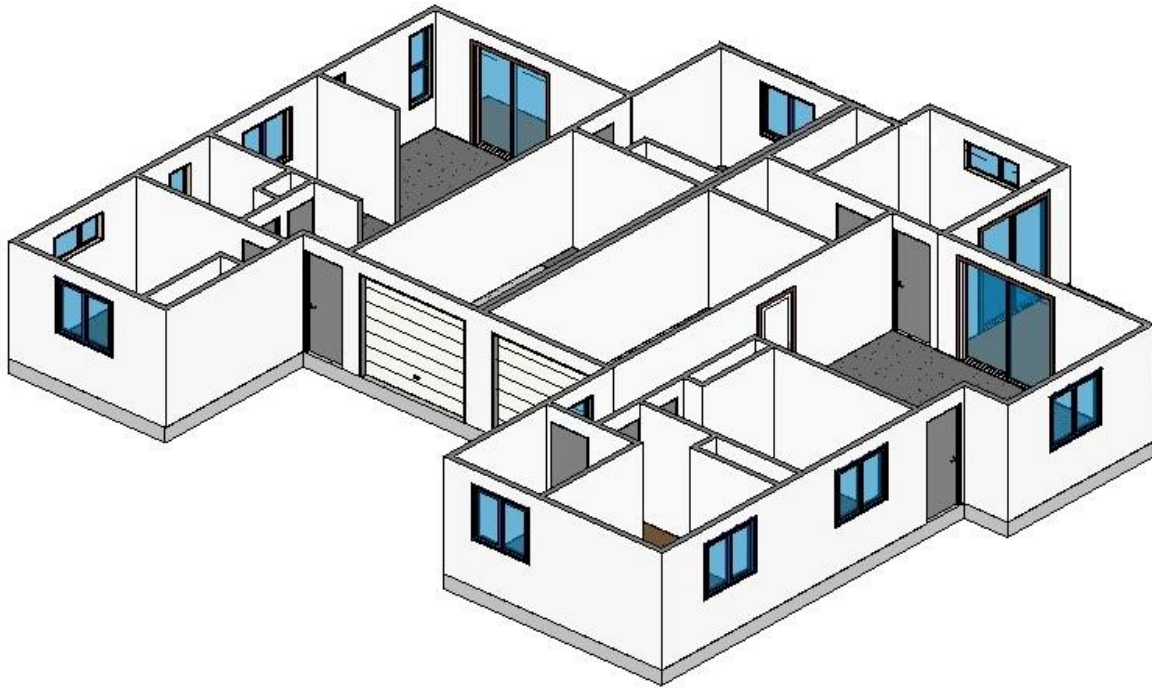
The wall-to-window ratio and the wall structure layout of the case study building
